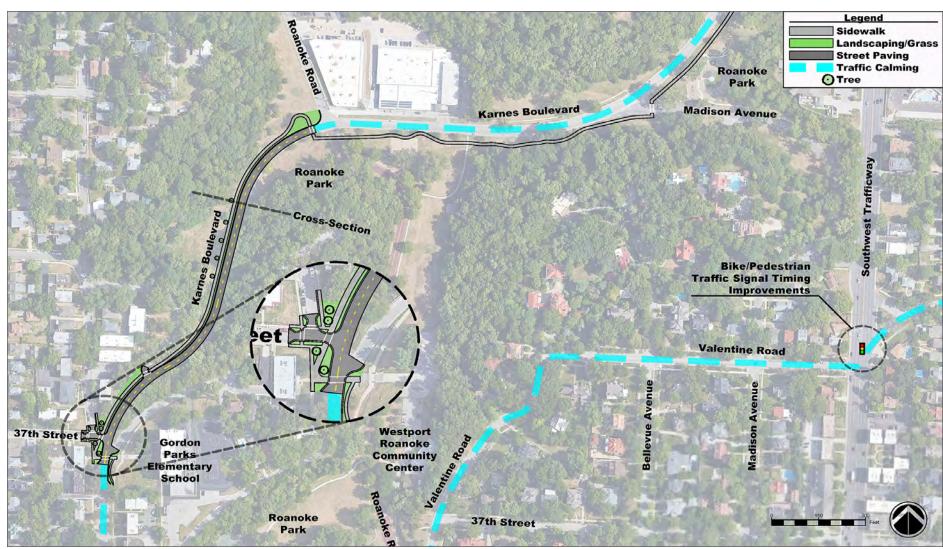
Roanoke Park Area: Plan Rendering on Wyoming Avenue / Karnes Boulevard and Valentine Road
